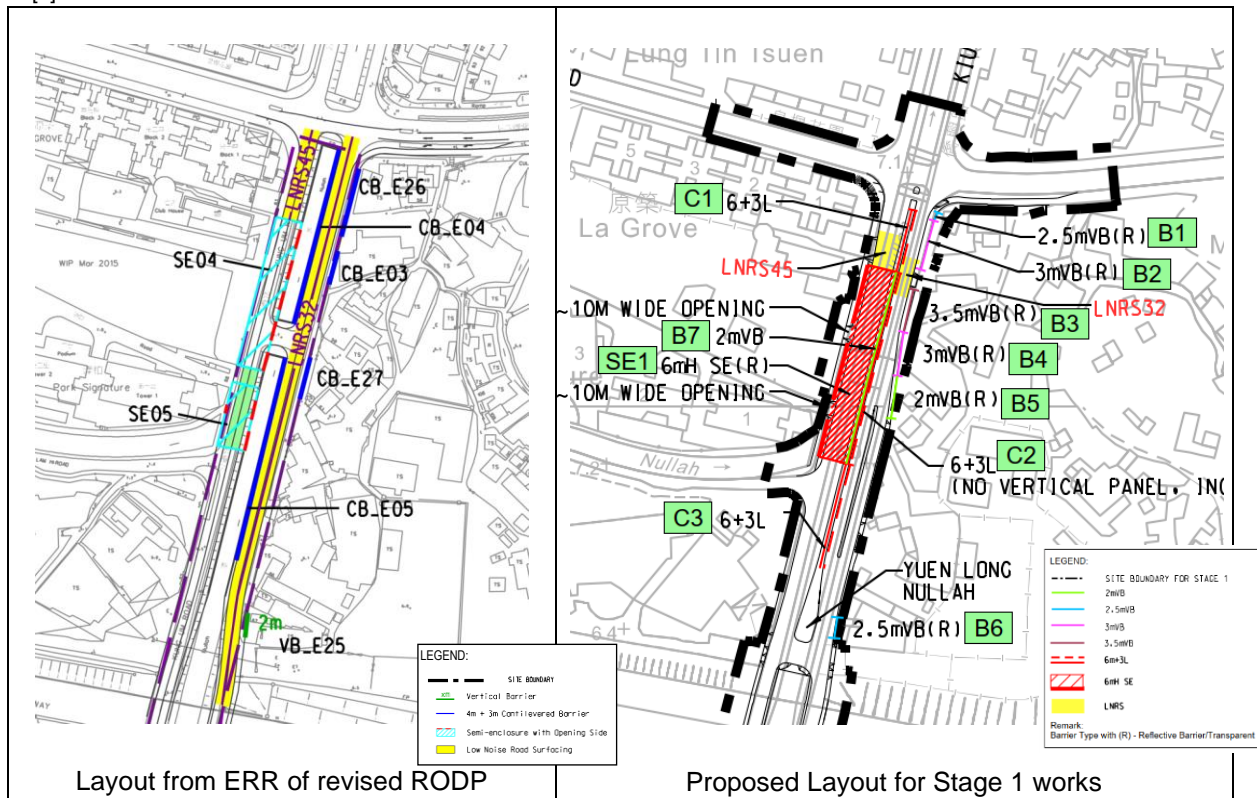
Recommended Mitigation Measures for Kung Um Road and Kiu Hing Road
